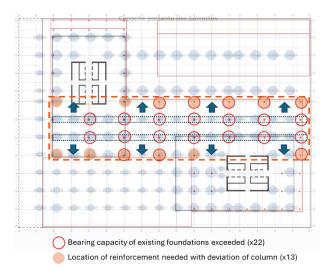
Reduction of foundation reinforcement thanks to the deviation of columns
